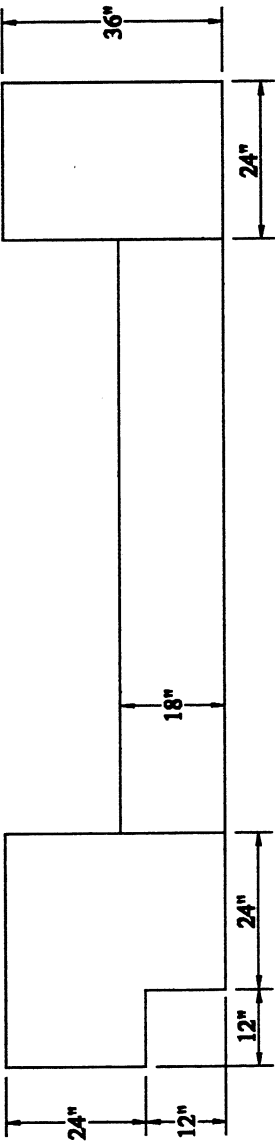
Reinforcement details for the 2<sup>nd</sup> floor beams of exterior transverse frames.
